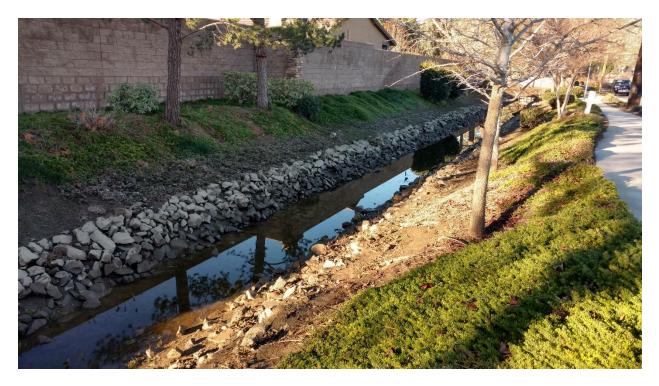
Ditch 2 south of Esplanade Avenue, facing east. Sample Point 02.
